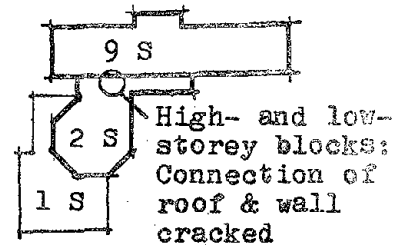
Beijing Peace Guest-house: Damage condition of connection of high- and low-storey blocks
